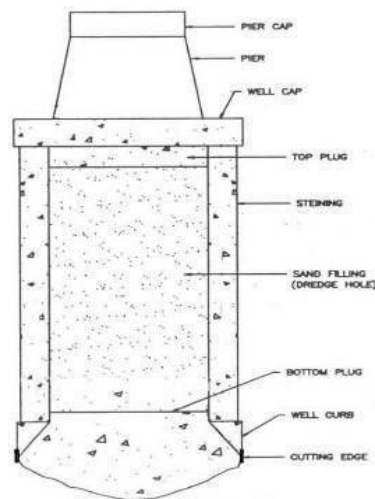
Typical Vertical Cross Section of a Circular Well Foundation
